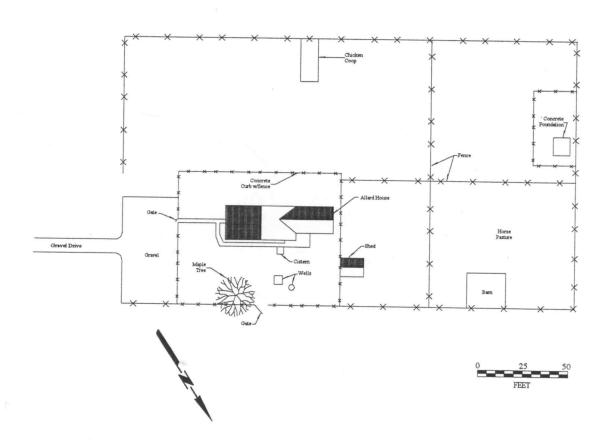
Site plan showing the Allard House and surrounding lot, 1995.
